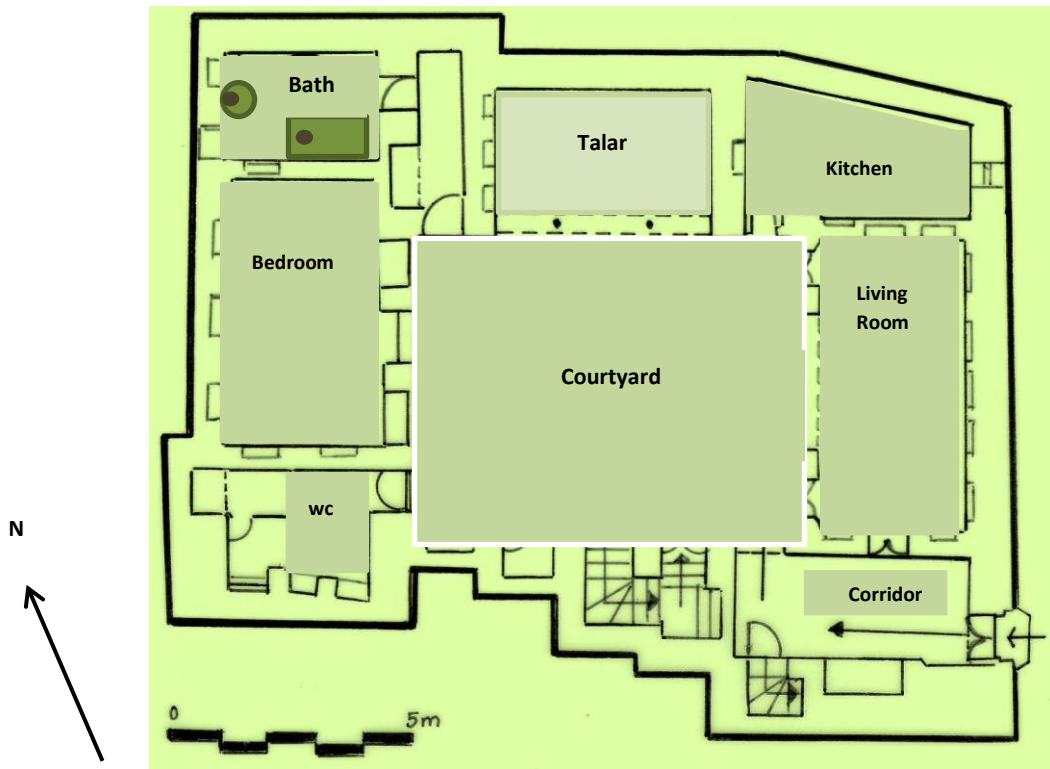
Ground floor level plan of the traditional courtyard house No. 5. Scale: 1:50
